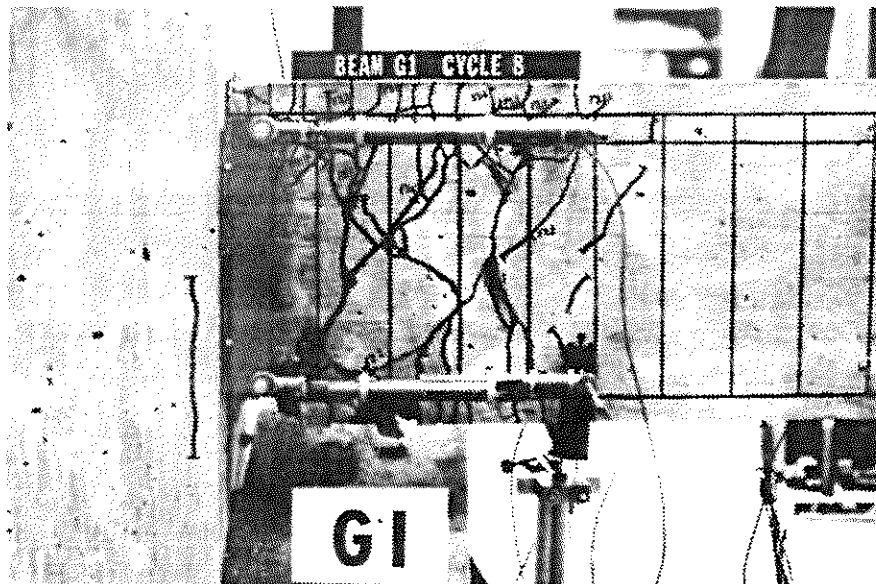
(b) Final Crack Pattern, Beam G-1
